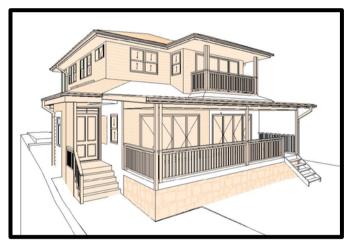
Proposed works as view from the front, in colour. (Action Plans 2020.)
